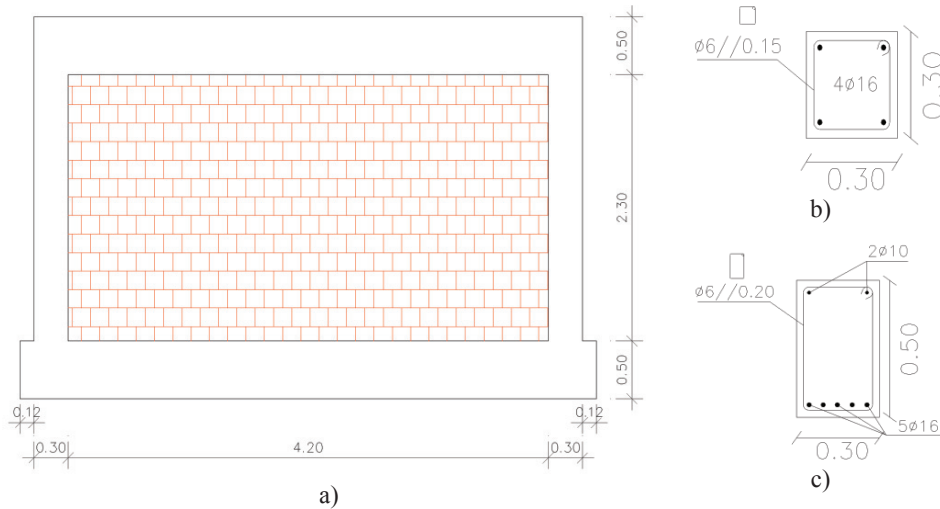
Infilled RC frame specimen dimensions a) general dimensions, b) columns and c) beams dimensions and reinforcement detailing.
